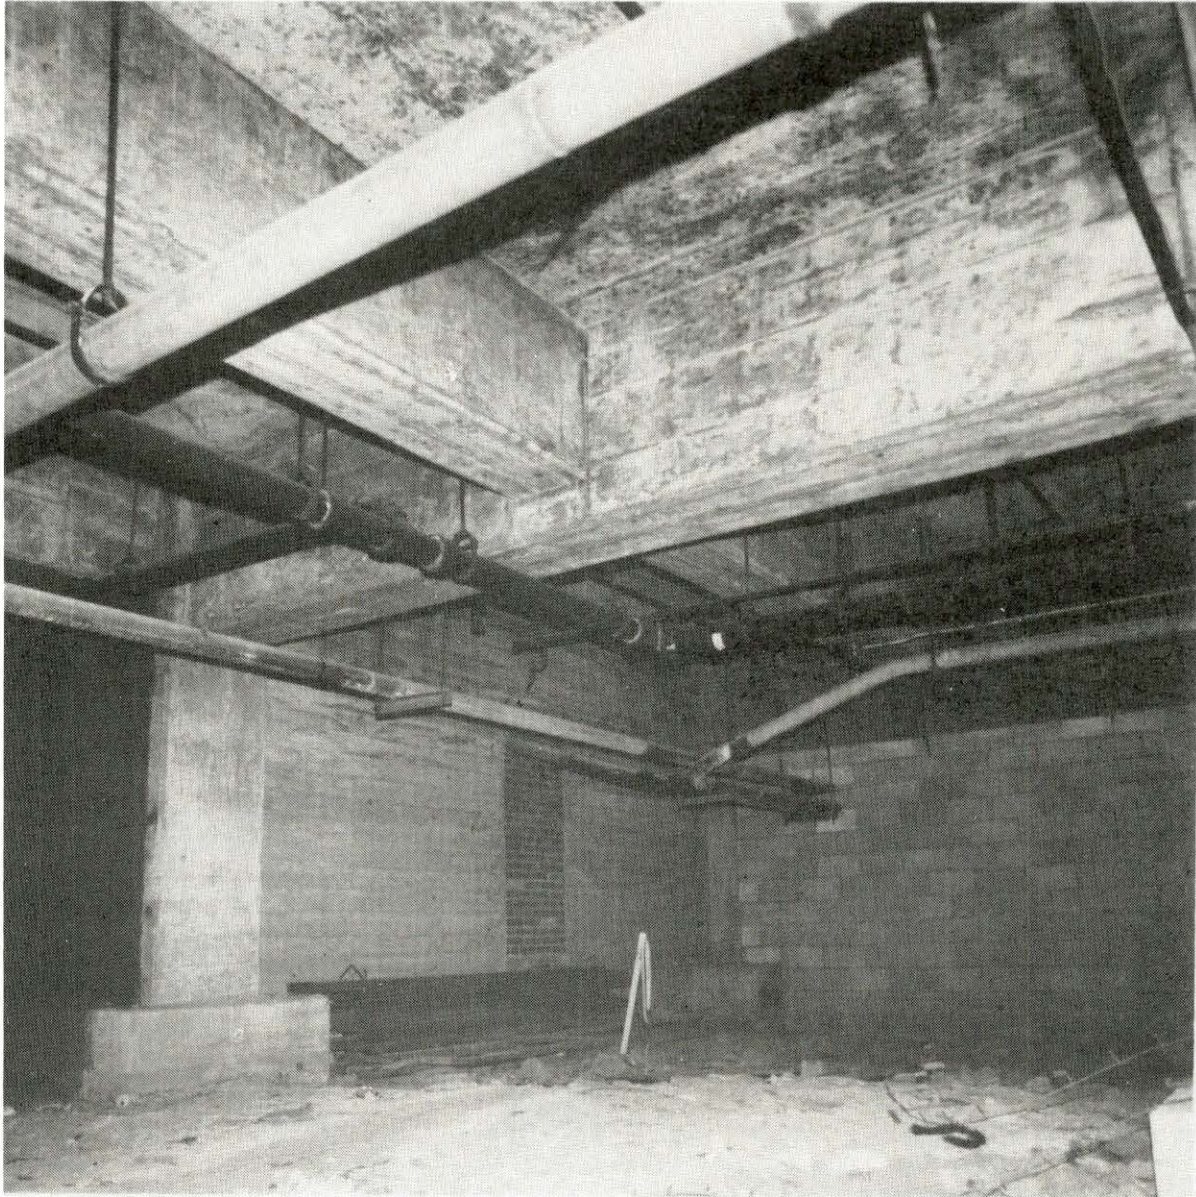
East end basement of Building 9204-1, looking southwest at radiation zone, Section III.
